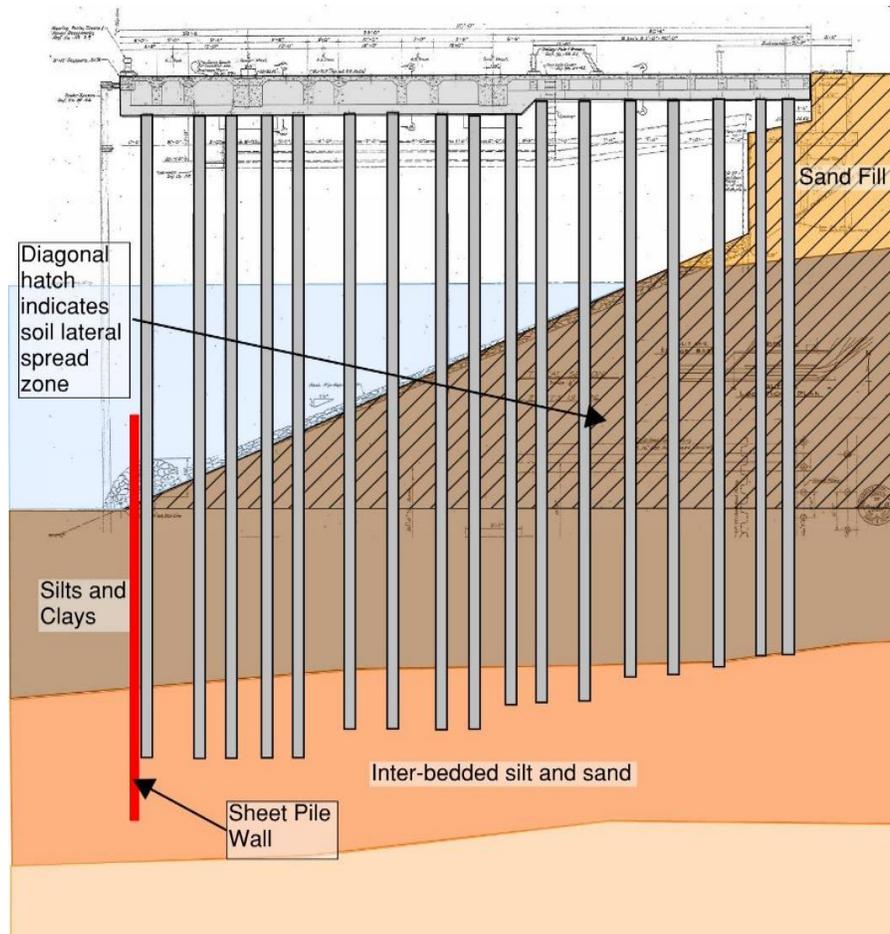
Berth 411 typical wharf section indicating zone of soil lateral spreading
